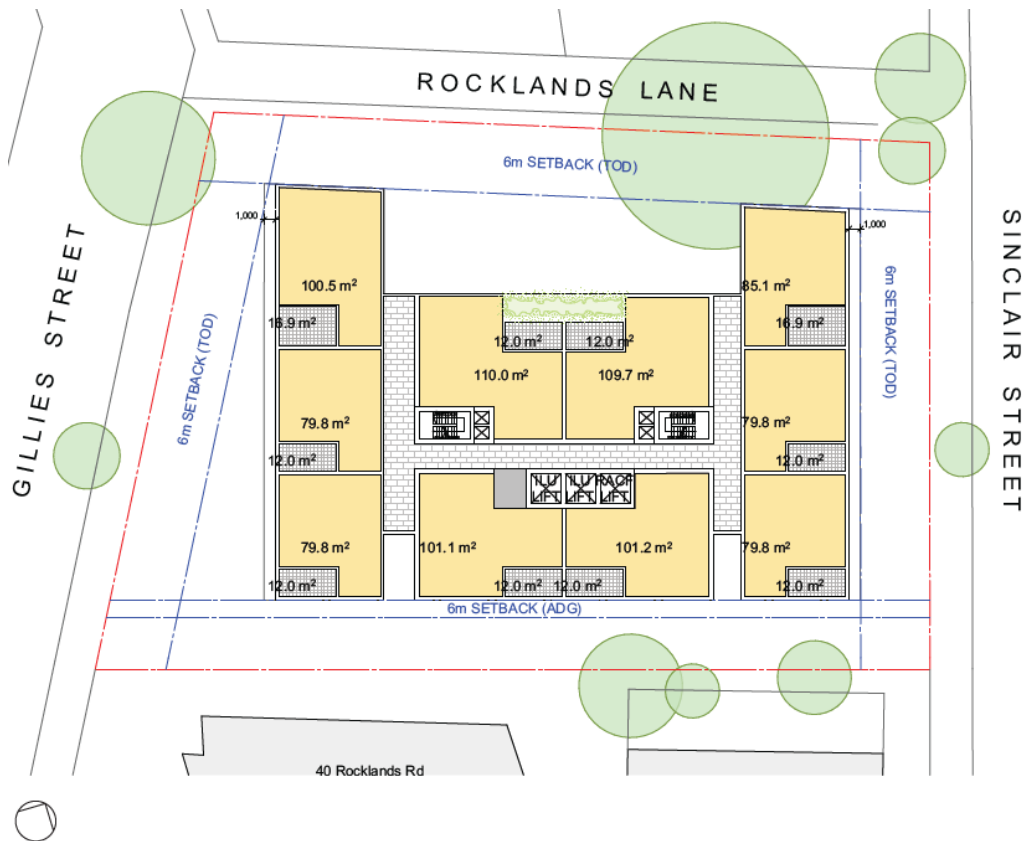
Typical level 3-6 Residential Level (DKO Architecture)
